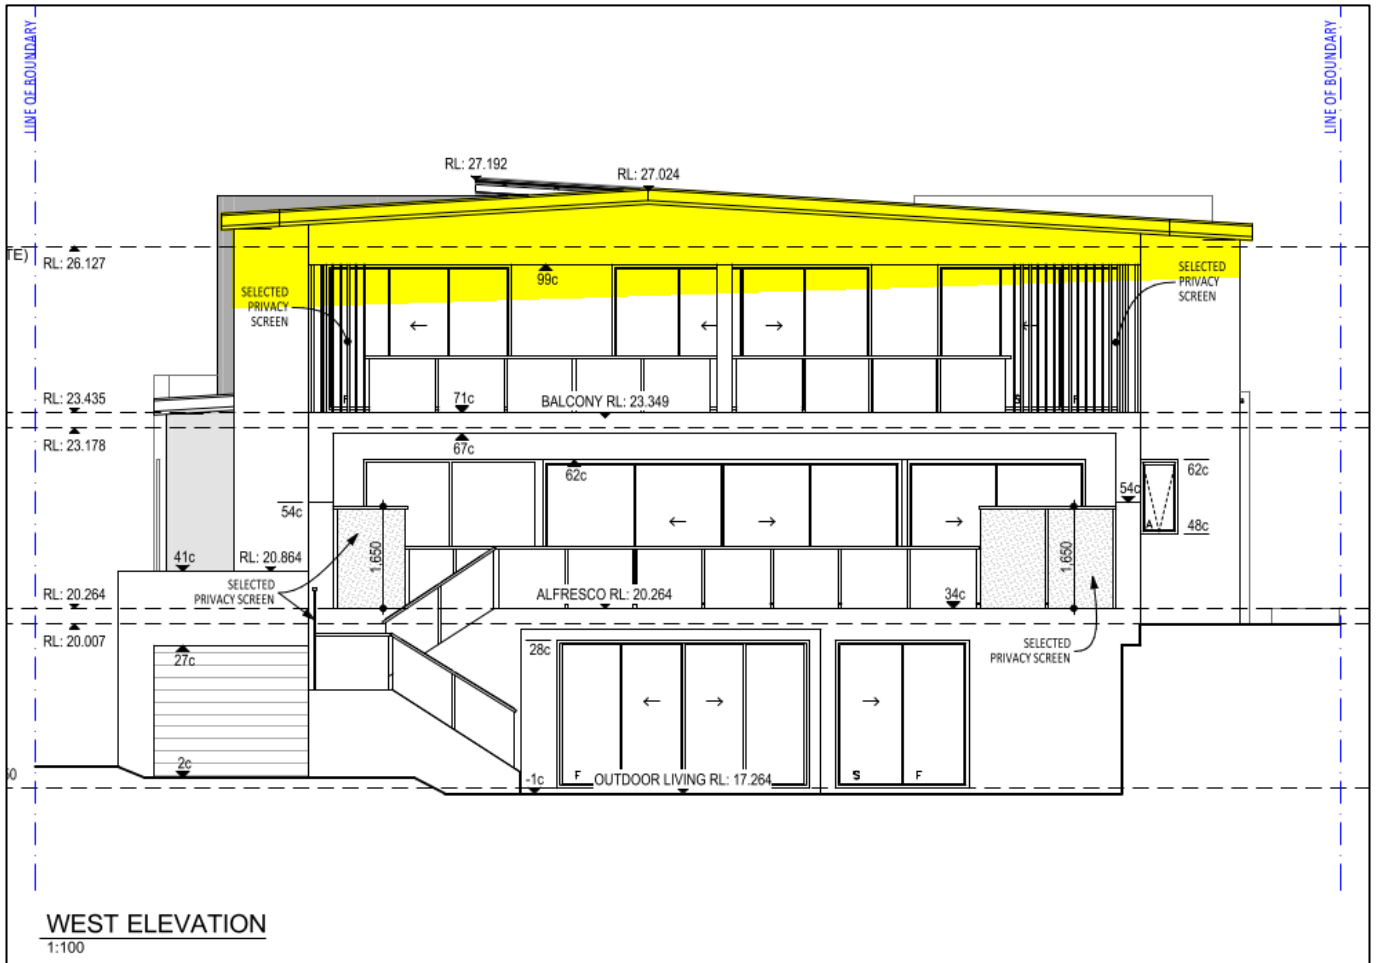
Diagram showing the over height portions of wall and roof from the western elevation (highlighted yellow).
